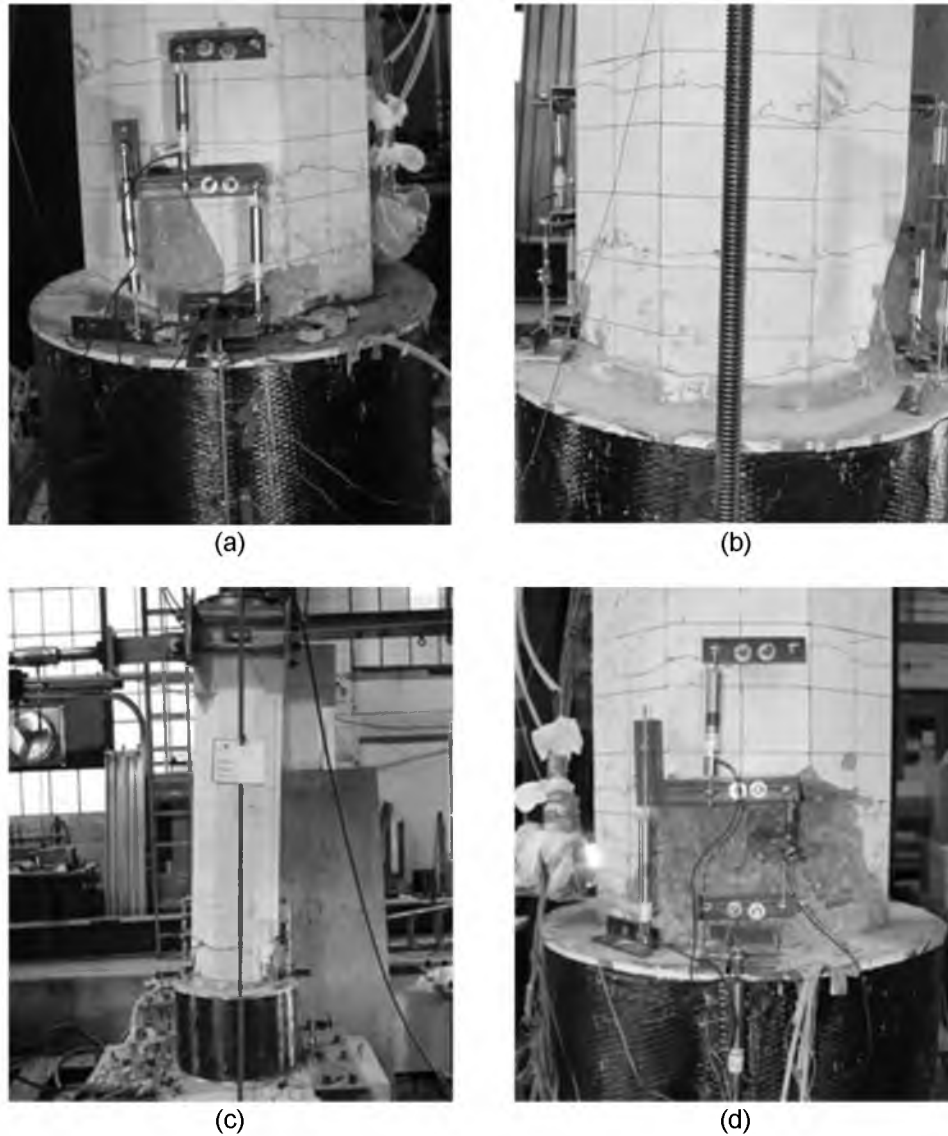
NMB-3 Repair test pictures through 5-in. displacement: (a) Spalling on east face after 3-in. displacement step, (b) Onset of minor shear x-cracking after 4-in. displacement step, (c) The displacement in which fracture occurred, 5-in. displacement step, (d) Damage on west side after 5-in. displacement step
